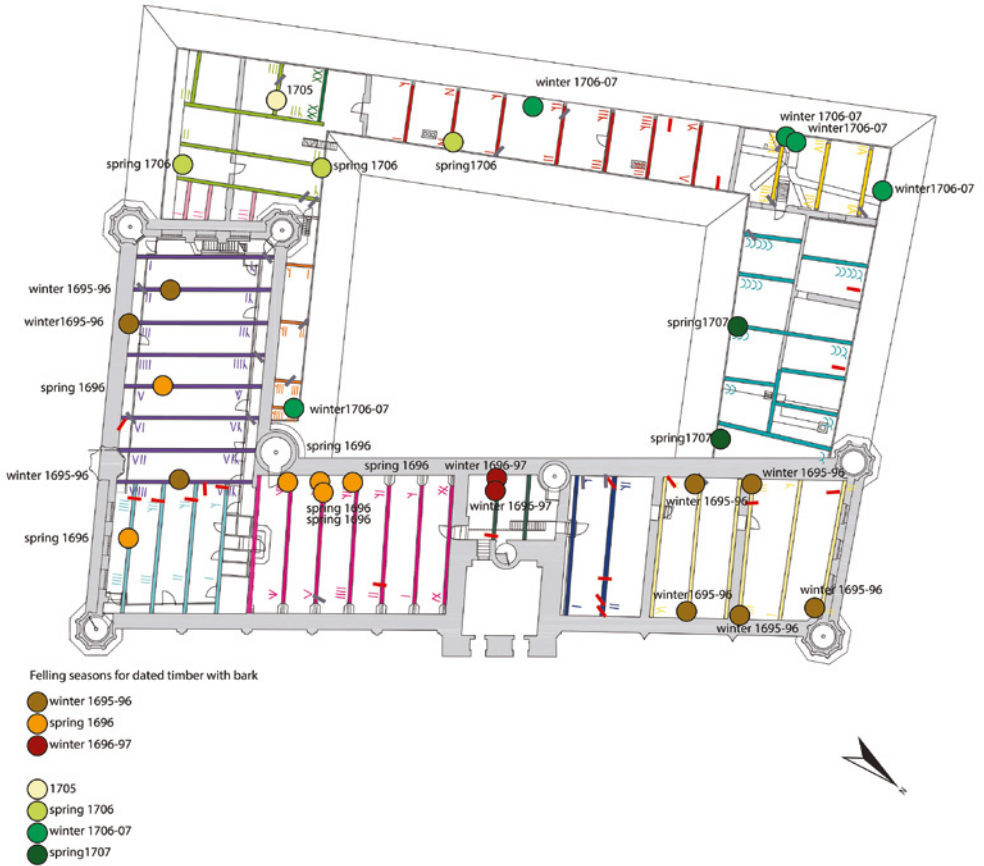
Dated samples with bark located on the plan of the Brussels Town Hall
